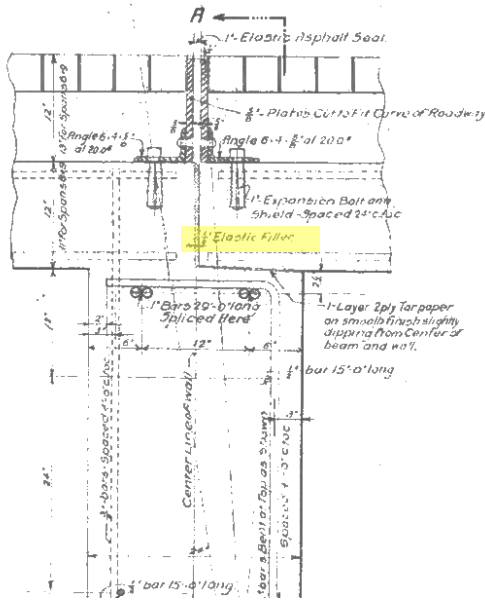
Detail from 1916 blue line plans with deck joint callout (highlighted).
